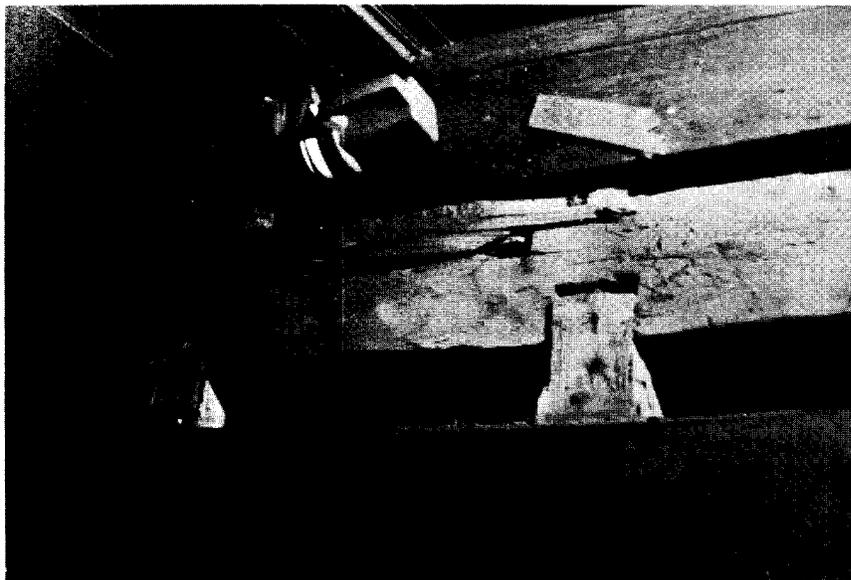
Atwood-Higgins House: First-Floor Framing, Southwest Corner of East Front Room.
